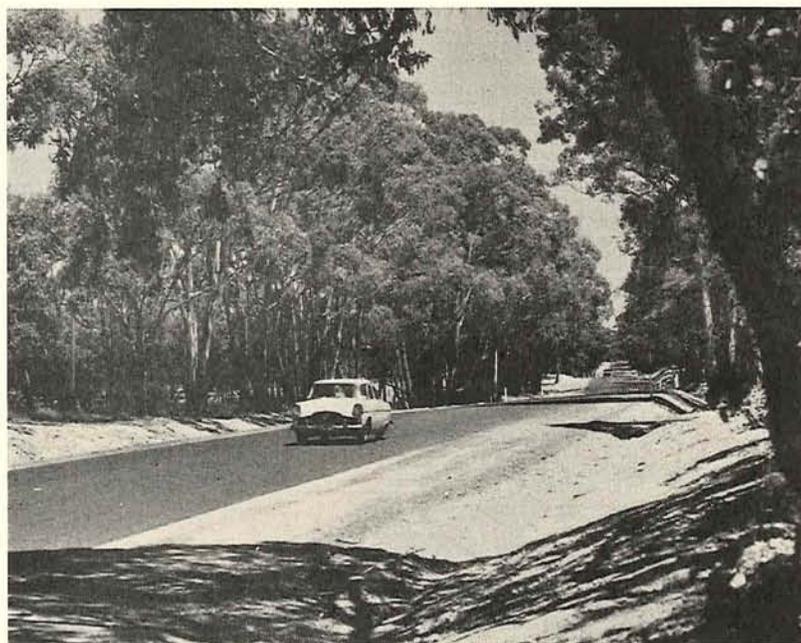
Wimmera Highway—Widened section between Dooen and Murtoa.
